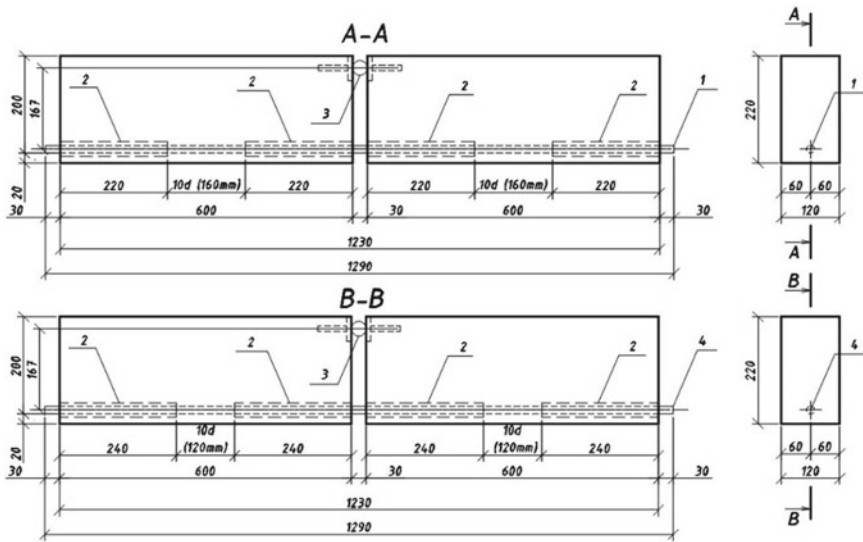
Structure of test specimens—concrete beams BSR and BFR: 1—steel reinforcement $\text{Ø}16$ A500C; 2—plastic tube; 3—steel cylinder; 4—fiberglass composite reinforcement $\text{Ø}12$ AKC800
